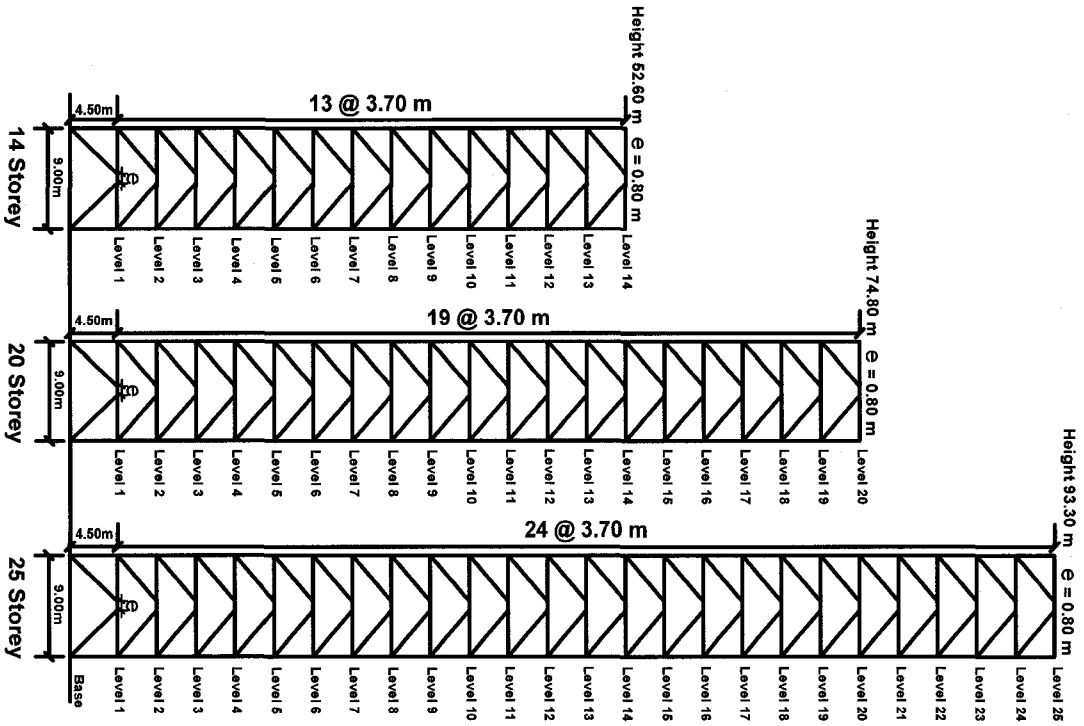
Typical elevations for 14, 20, 25 storey EBF
